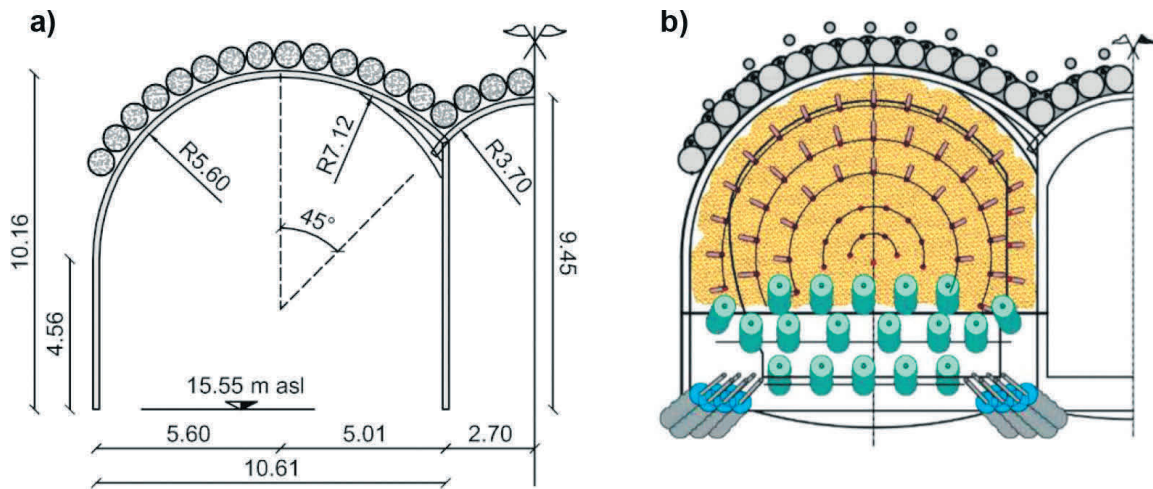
Excavation section type A: a) size; b) ground improvement at the face (from top to bottom: pre-support pipes, fiberglass elements and injections, jet grouting columns at the front and below the temporary lining).
